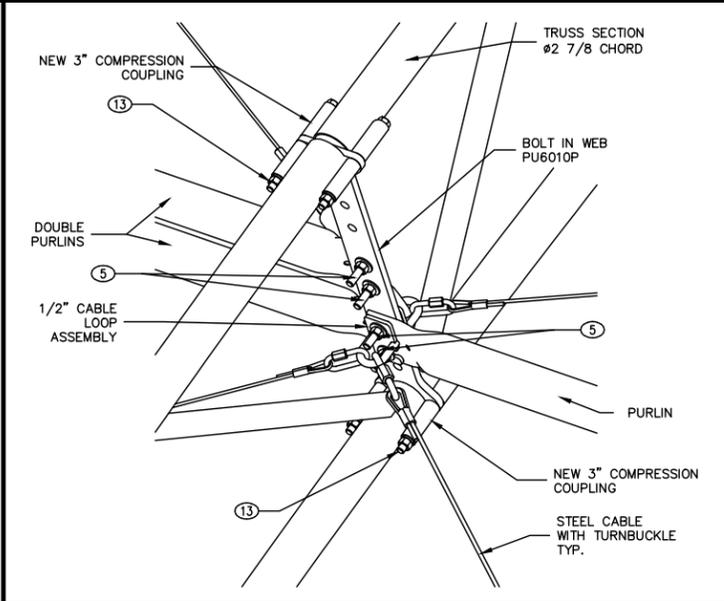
PURLINS AT END AT WELD IN WEB - TWO CABLES
